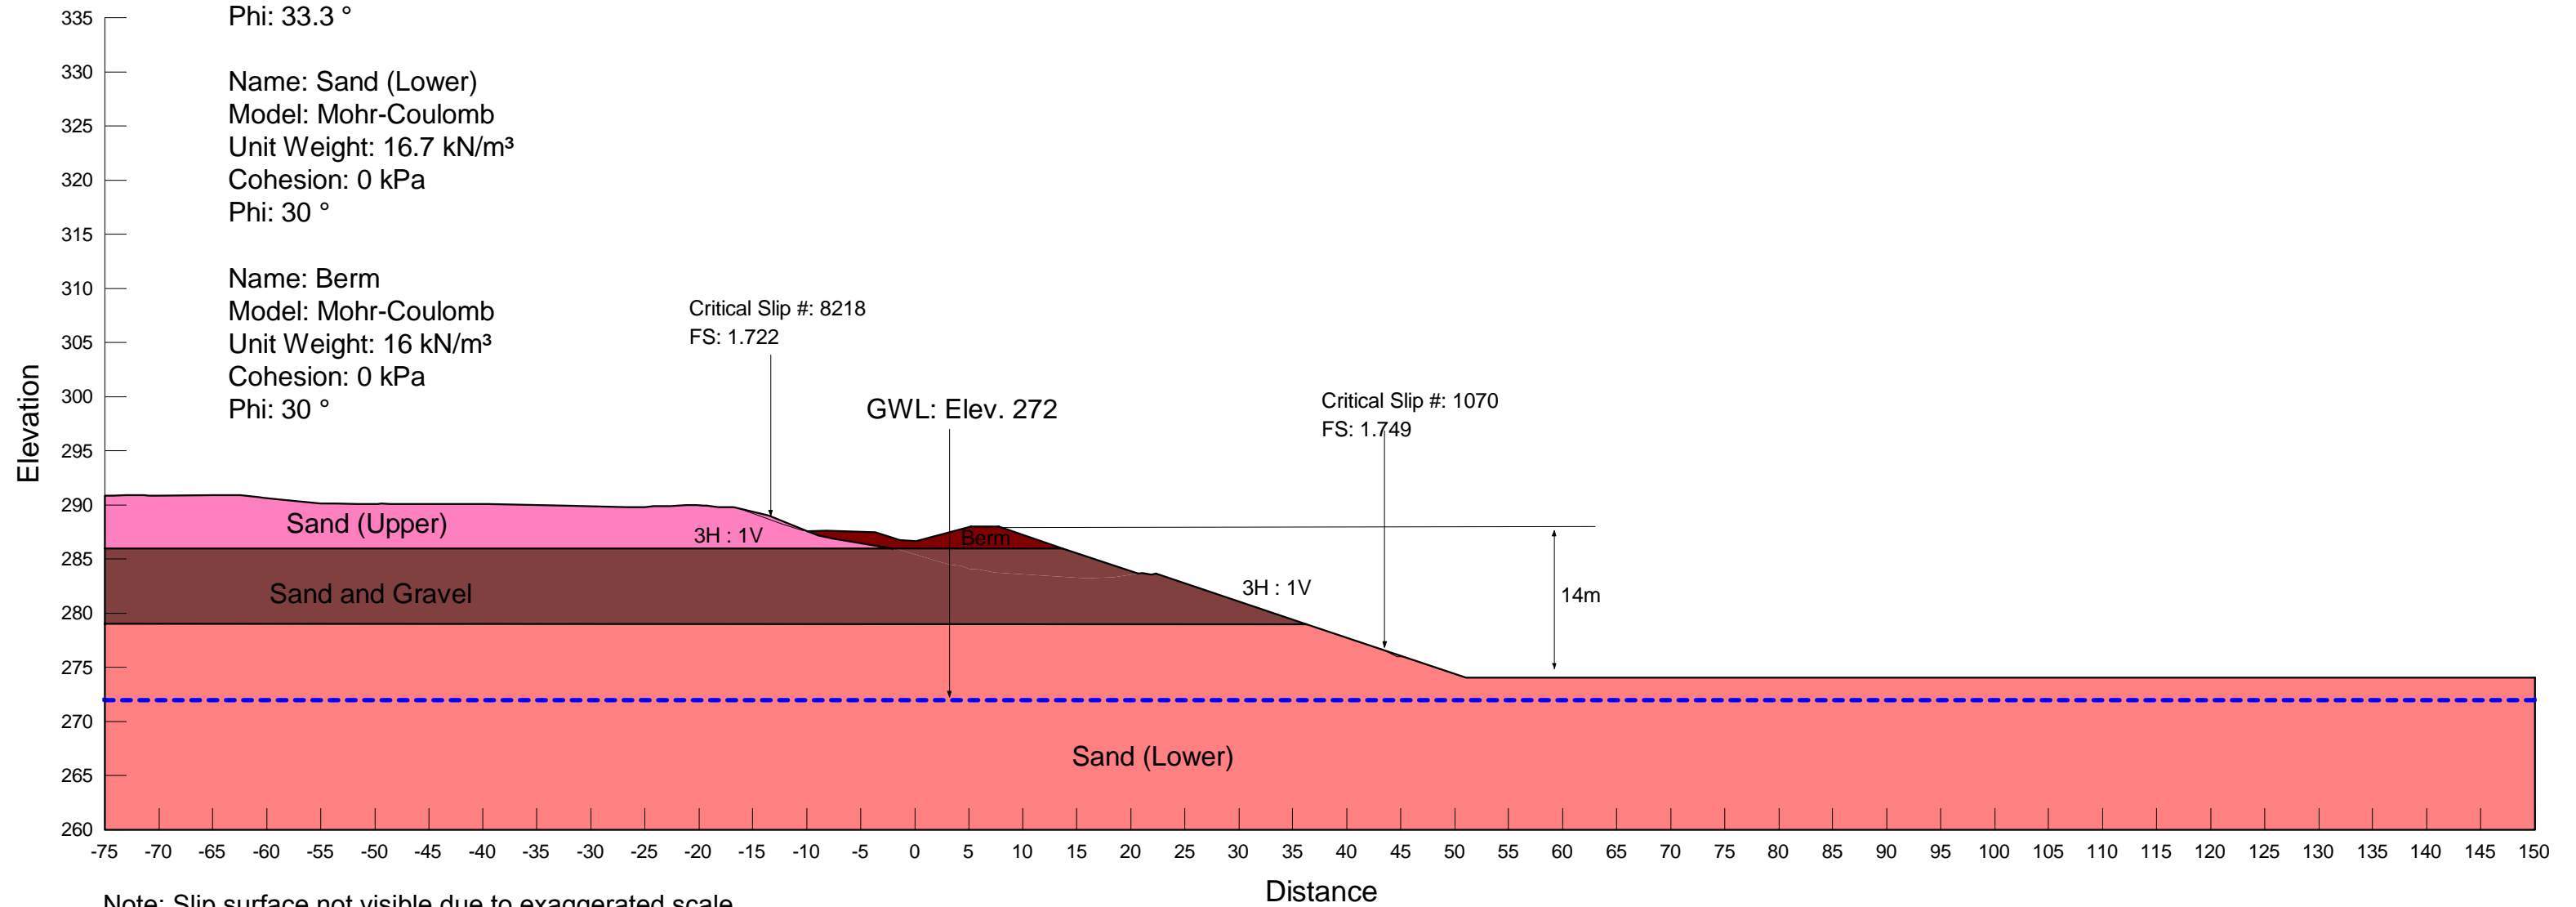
Cell 6 Excavation - Section 0+400 - 2014
